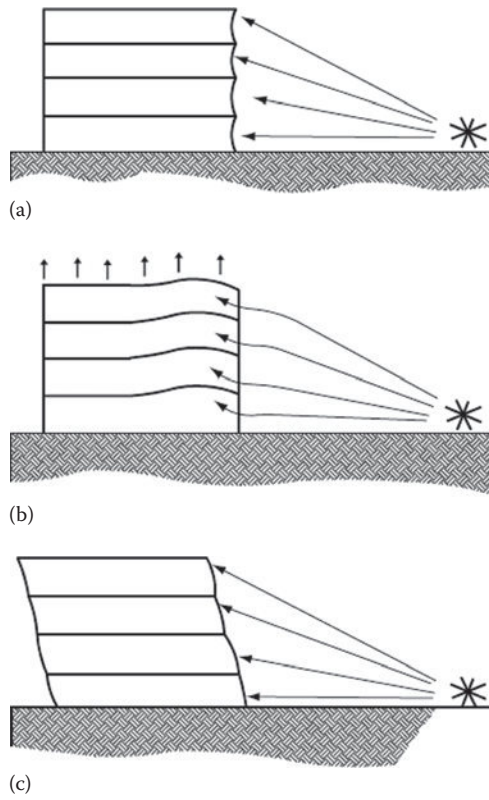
Damage due to exterior explosion. (a) Exterior windows, columns, and walls. (b) Roof and floor slabs. (c) Building sway due to ground shock.
